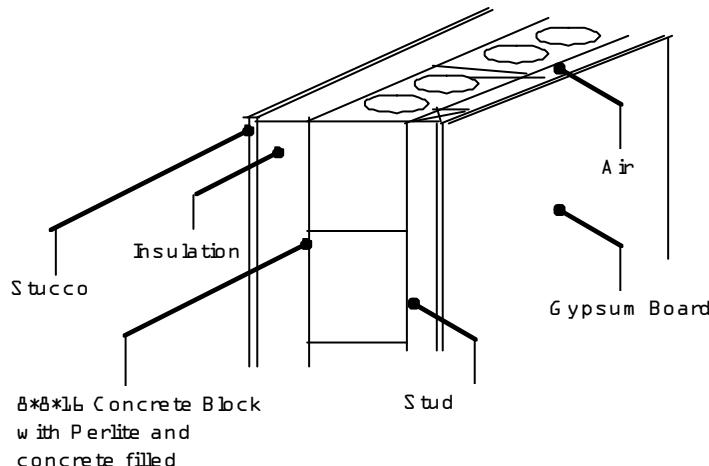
8" block wall with perlite and concrete fill (IECC1309.inp).
